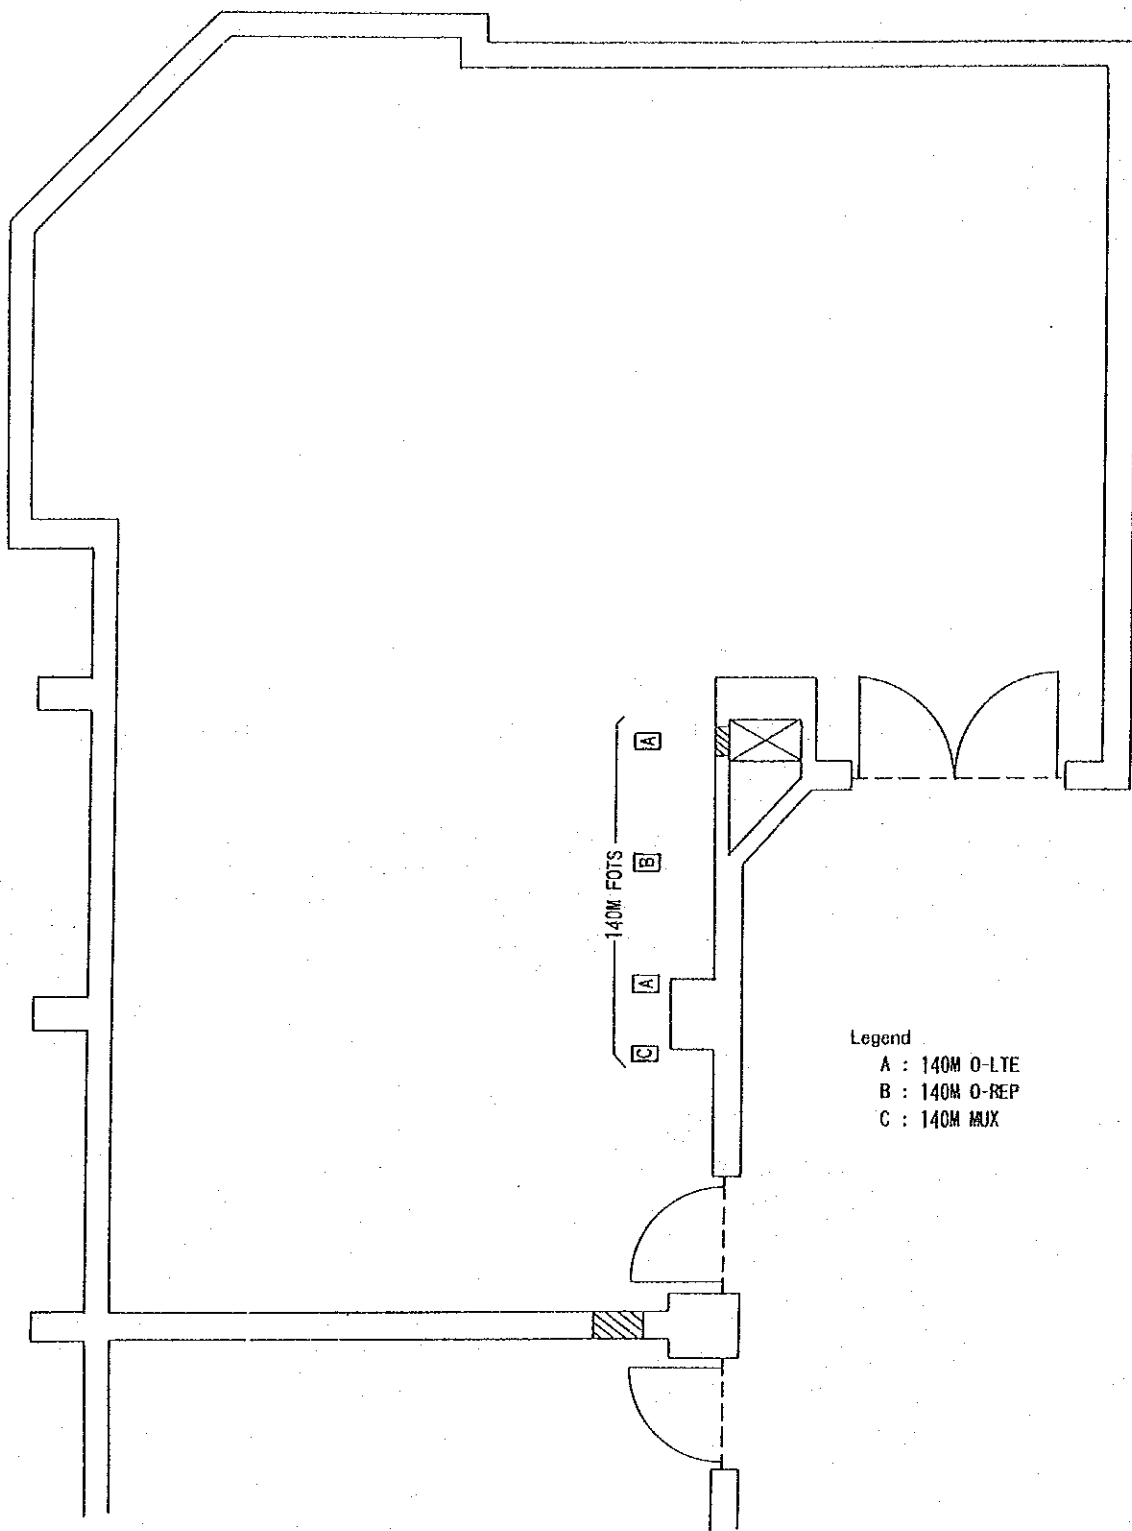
Equipment Layout Plan in Optical Fiber Lab.
